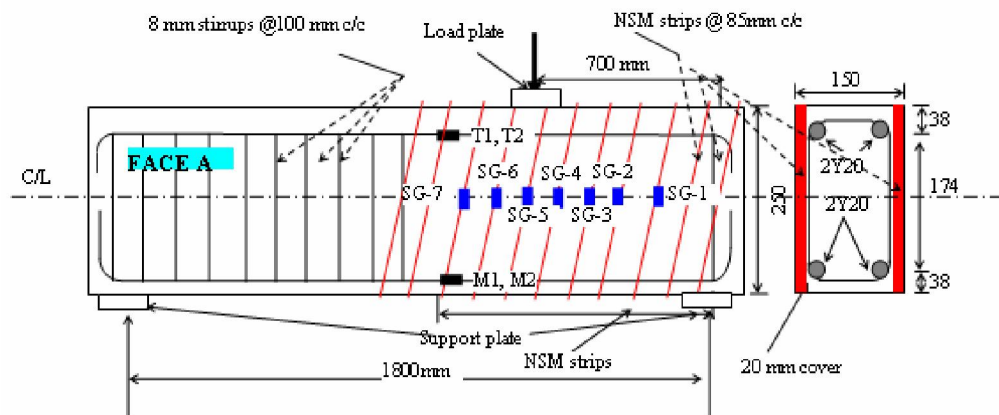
Arrangement of strain gauges on main bars and on NSM Steel Strips (Face A) (B1-SS)
